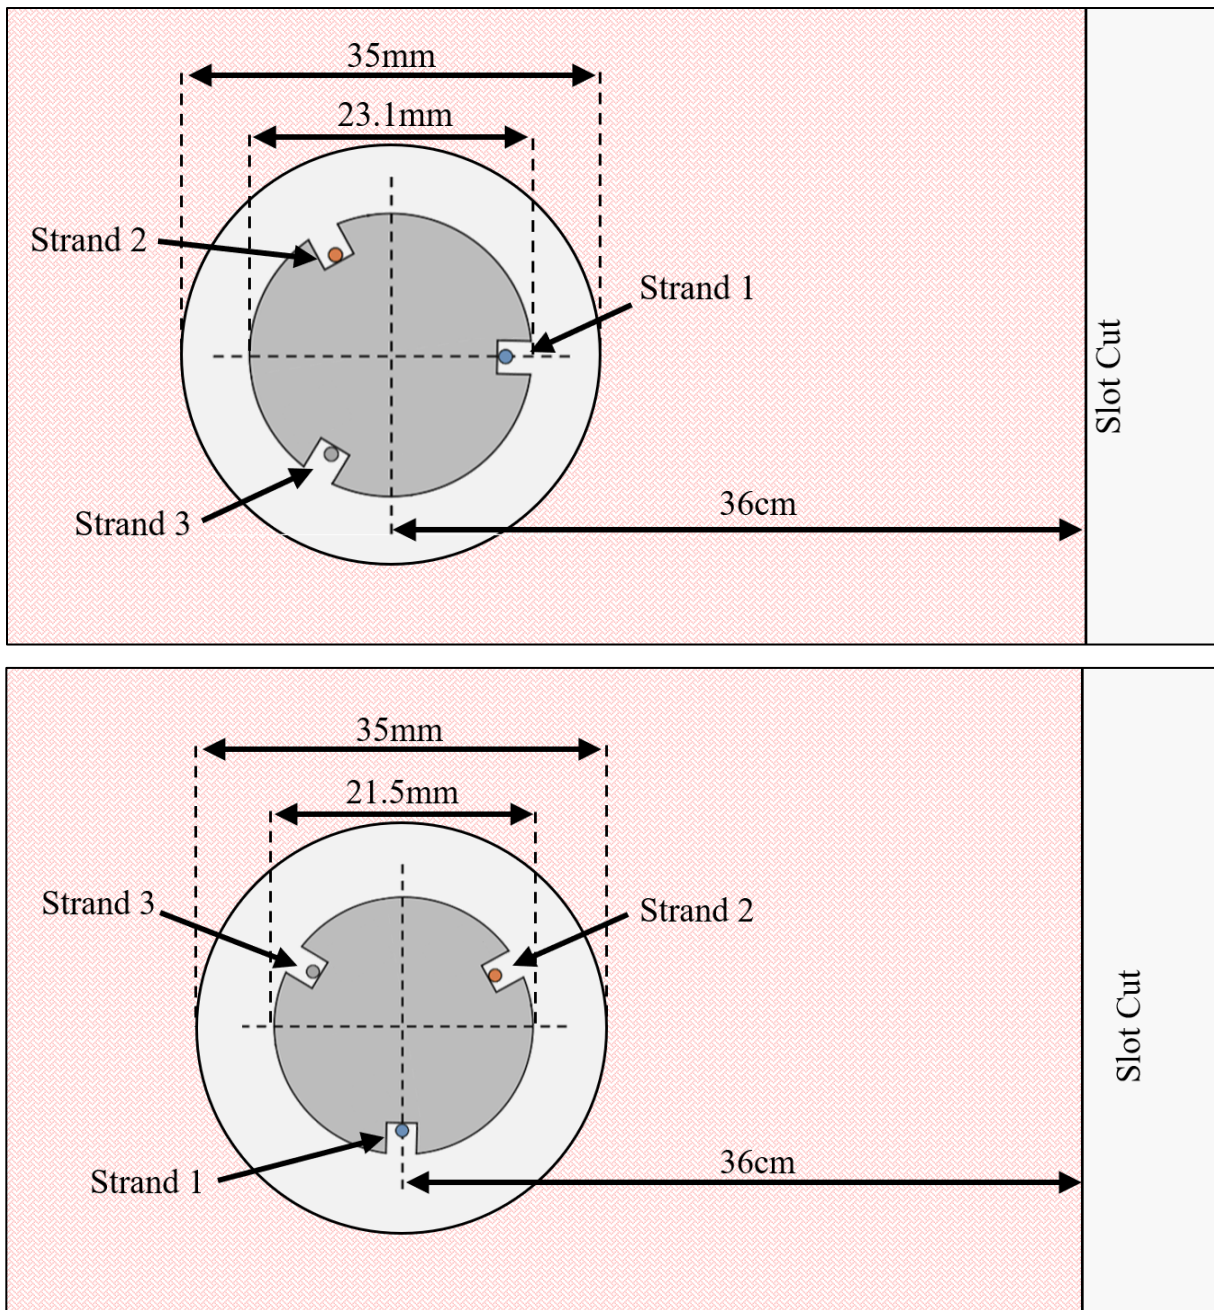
Plan view orientation of fibre-optic strands on instrumented 25M Grade 400 rebar (top) and 22M Grade 500 dywidag (bottom) relative to the slot cut in plan view (not to scale)
